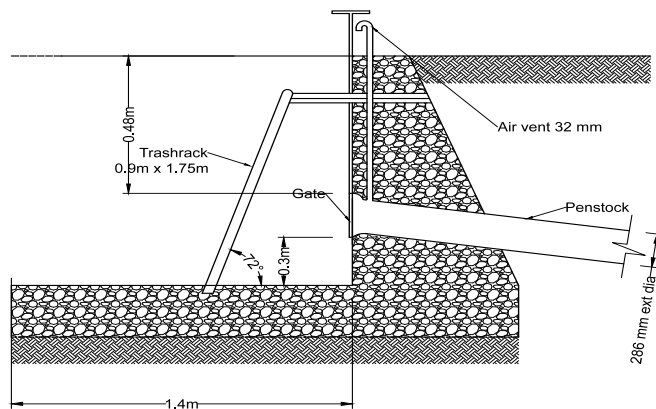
Design of the forebay tank with trash rack and air vent shown (AutoCAD)
